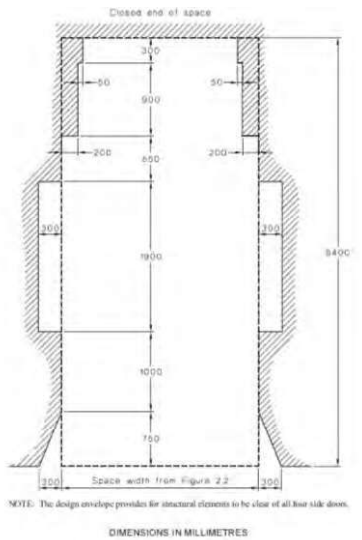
DESIGN ENVELOPE AROUND PARKED VEHICLE TO BE KEPT CLEAR OF COLUMNS, WALLS AND OBSTRUCTIONS
